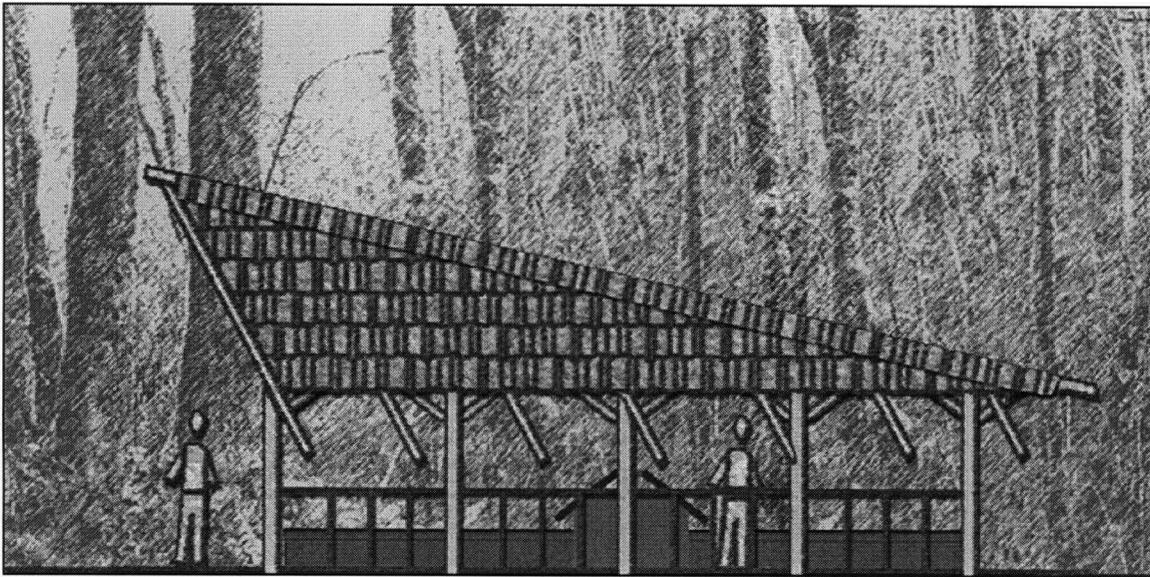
8 Eco Centre East Elevation. Scale 1:125
